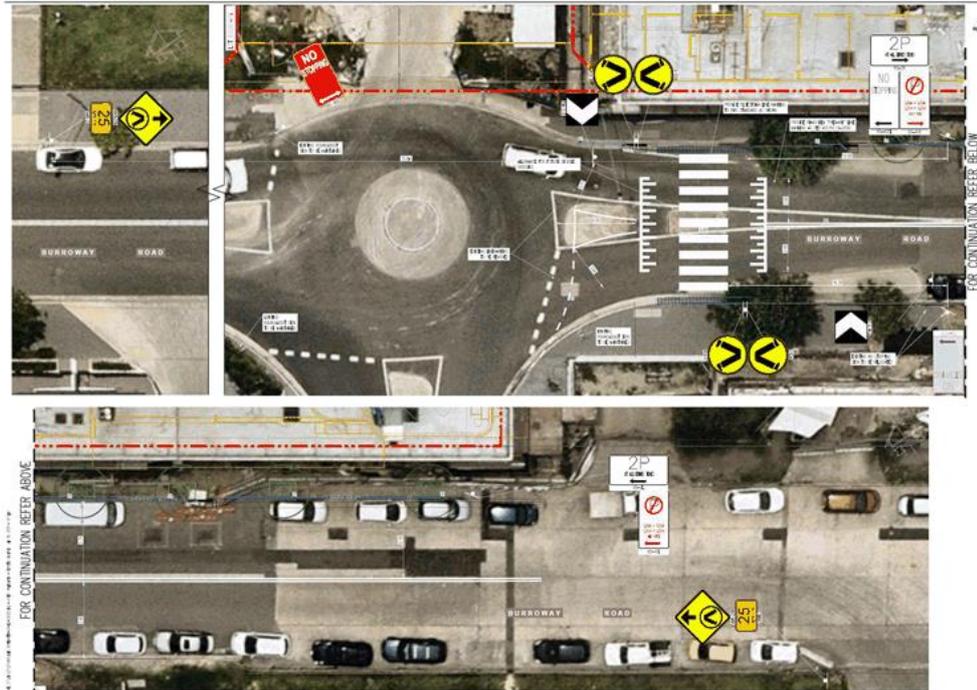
Plan showing the concrete works for the proposed raised pedestrian crossing in Burroway Road, Wentworth Point
